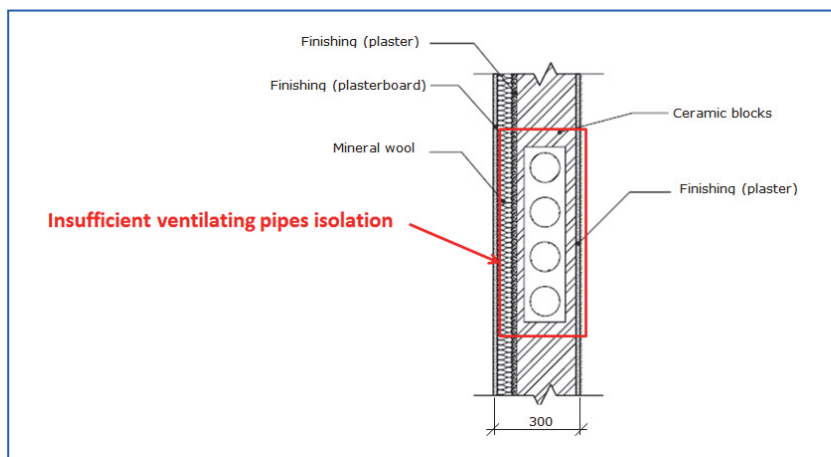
Cross section (horizontal) of separating wall between flats.
